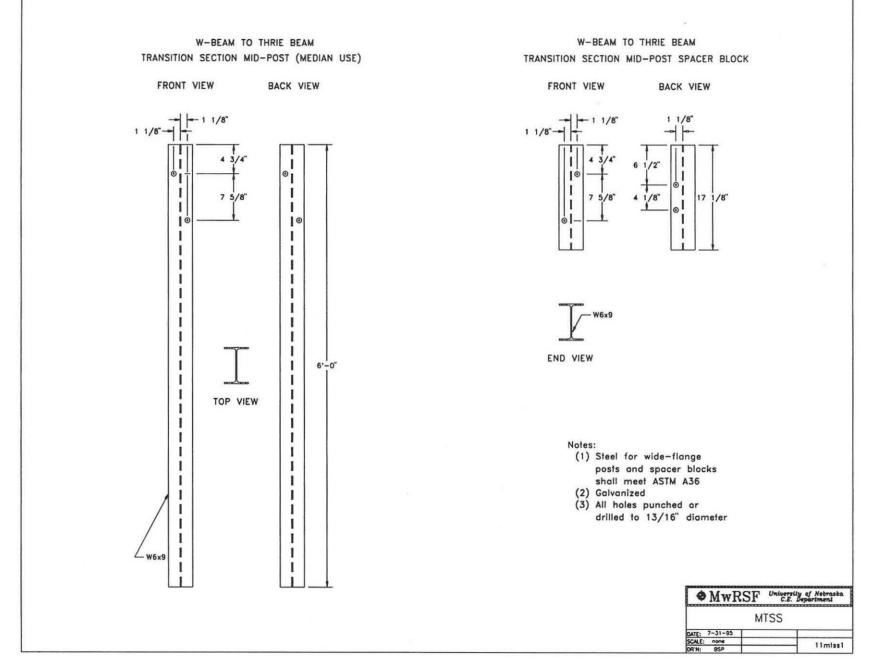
W-Beam to Thrie Beam Post and Spacer Details, Design No. 1
